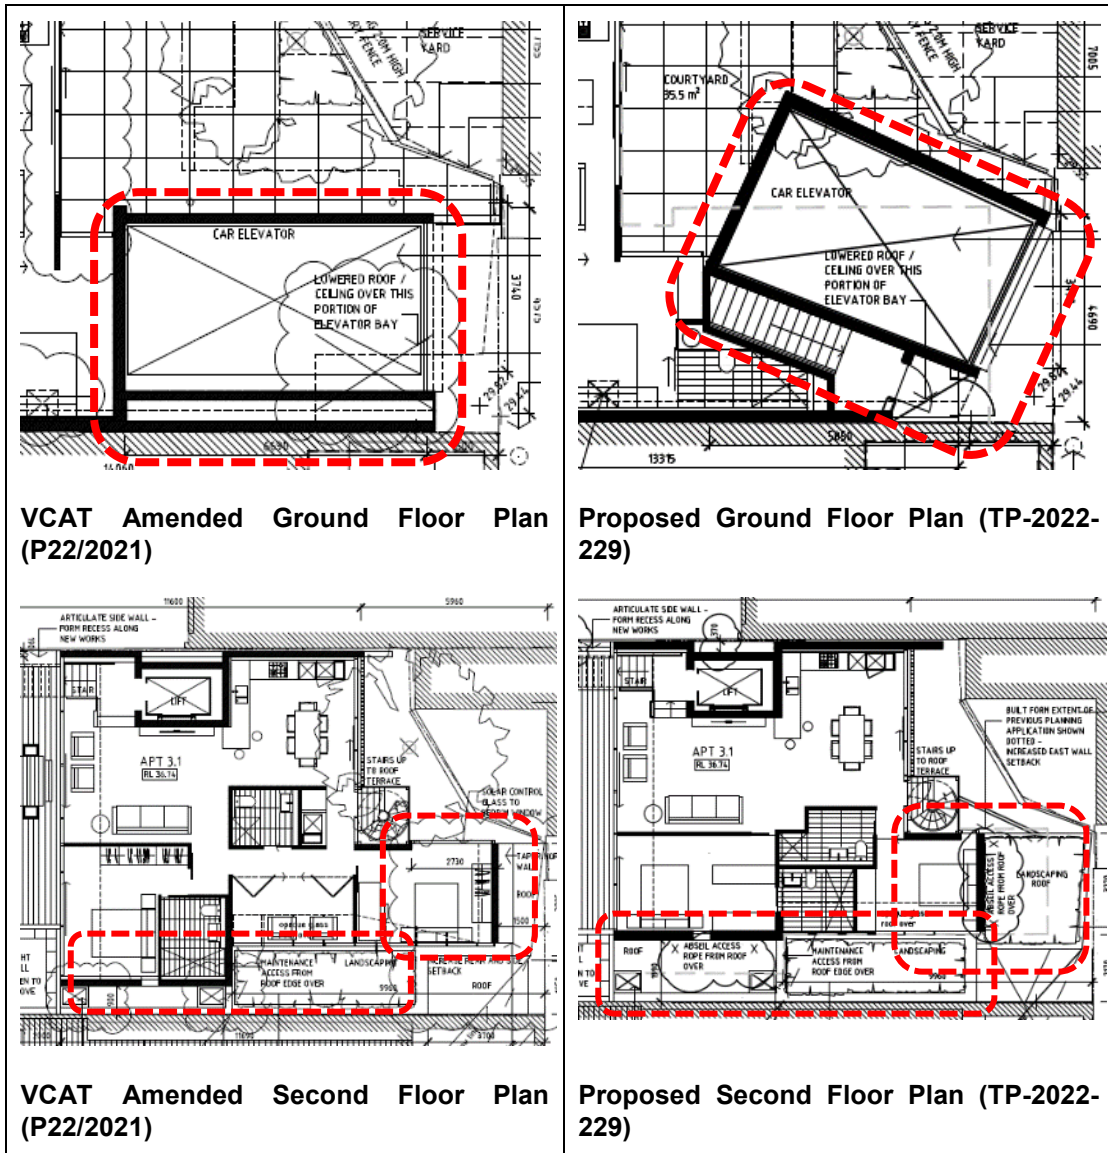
Key material changes between plans considered at VCAT and current proposal
